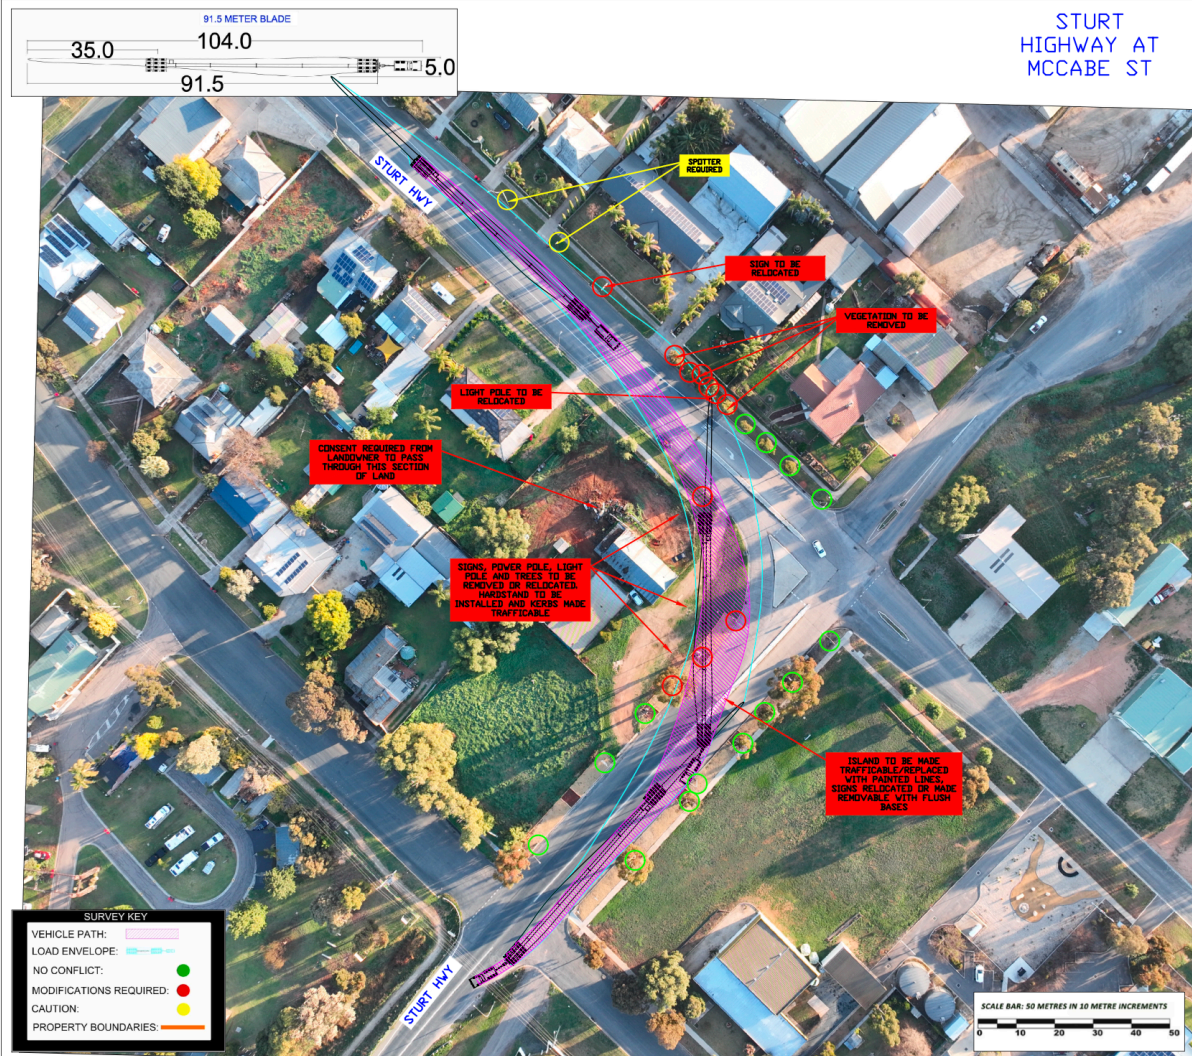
Sturt Highway intersection with McCabe St at Balranald
